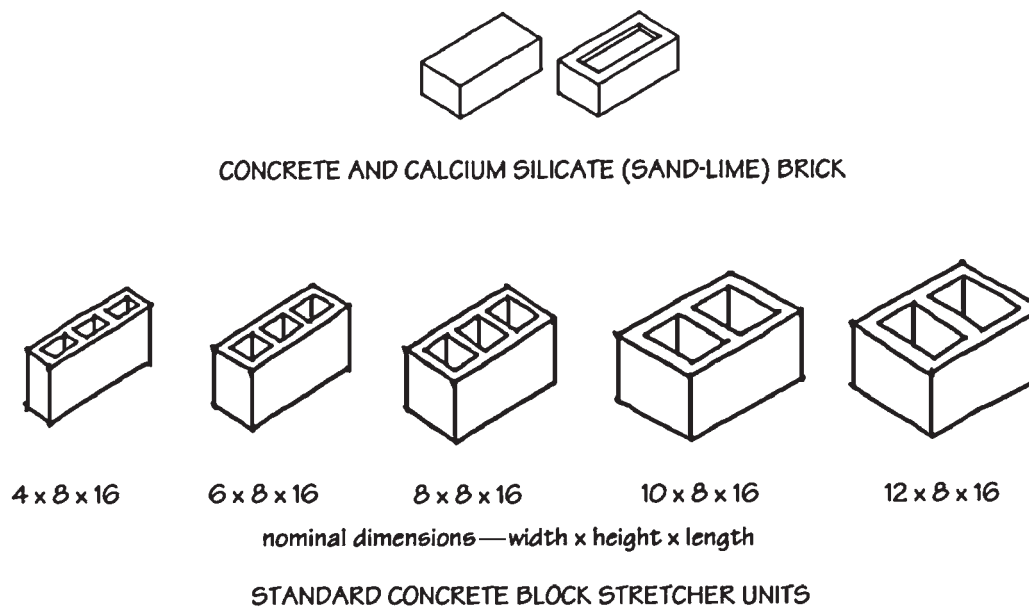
Basic concrete masonry unit sizes and shapes.
